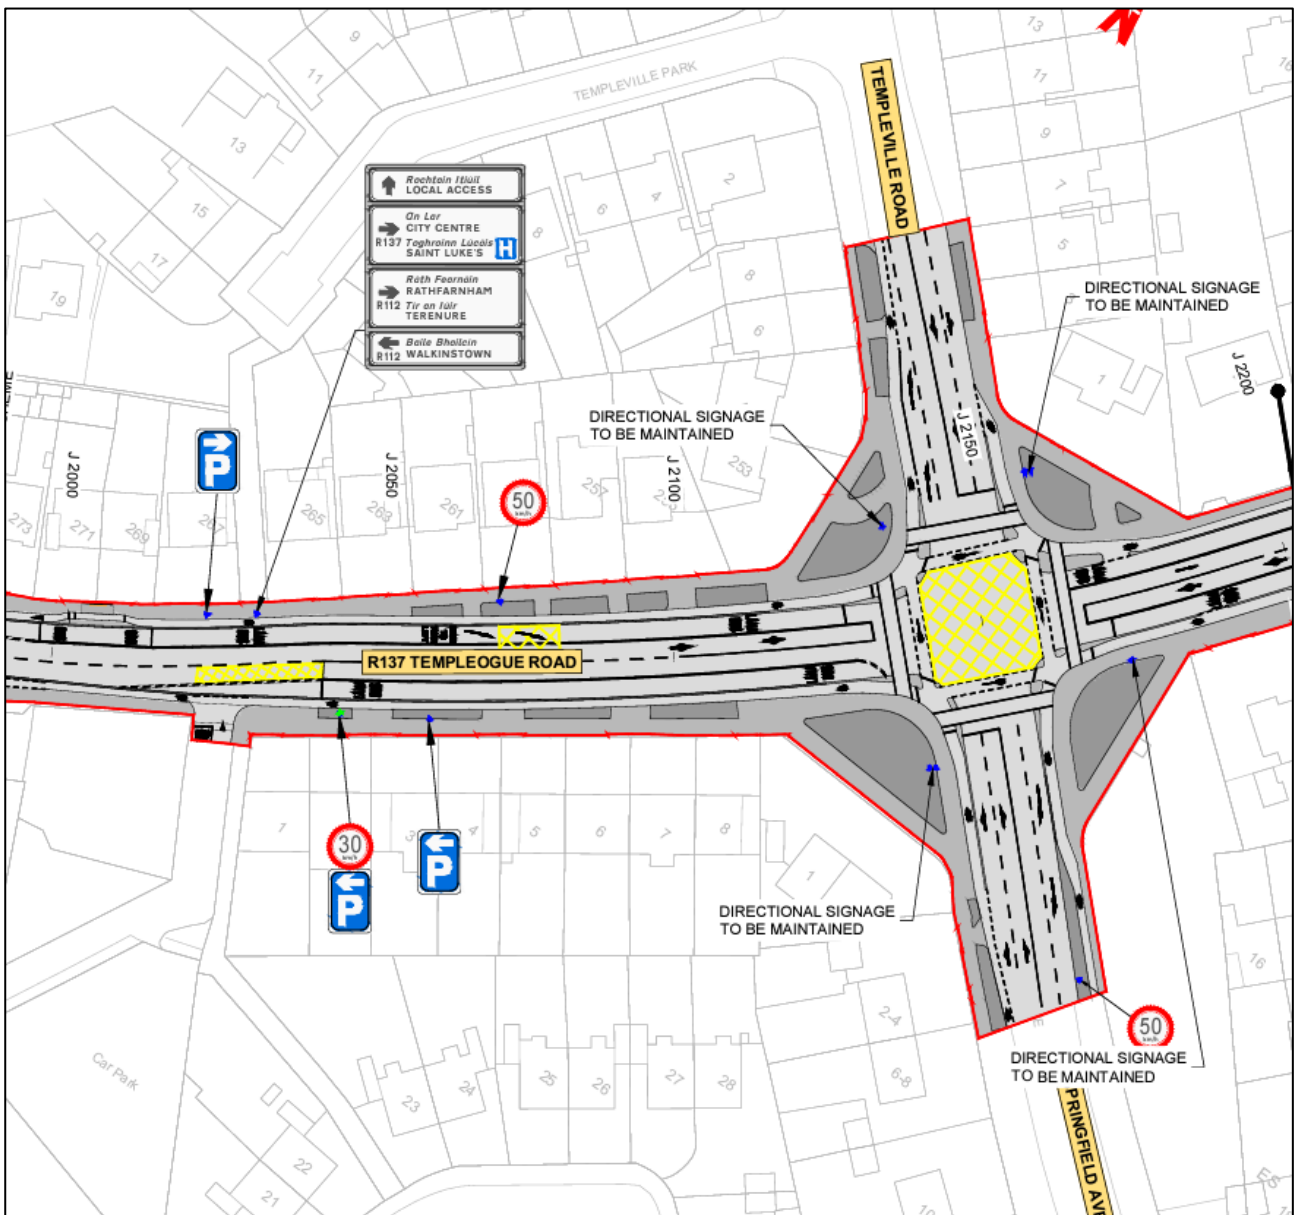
Extract from Traffic Signs and Road Markings Drawings (Sheet 33)
